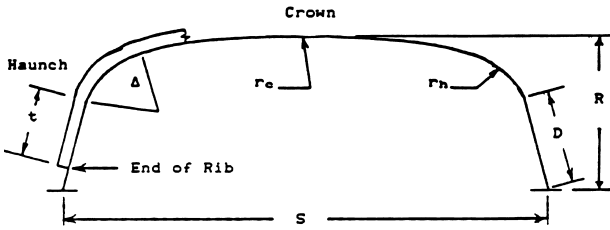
A Standard Terminology of Structural Plate Box Culvert Shapes
